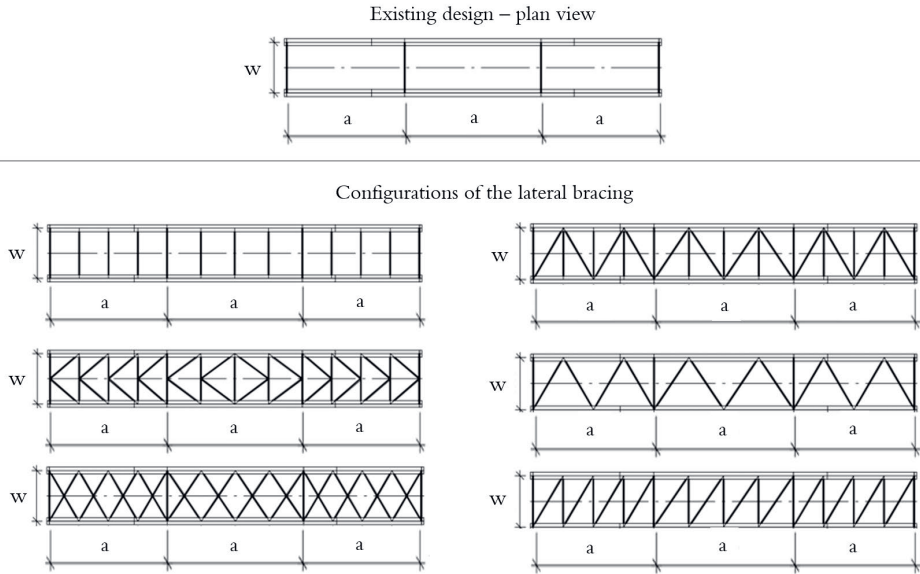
Existing bridge design (plan-view) and the additional six configurations where a lateral bracing is added.
